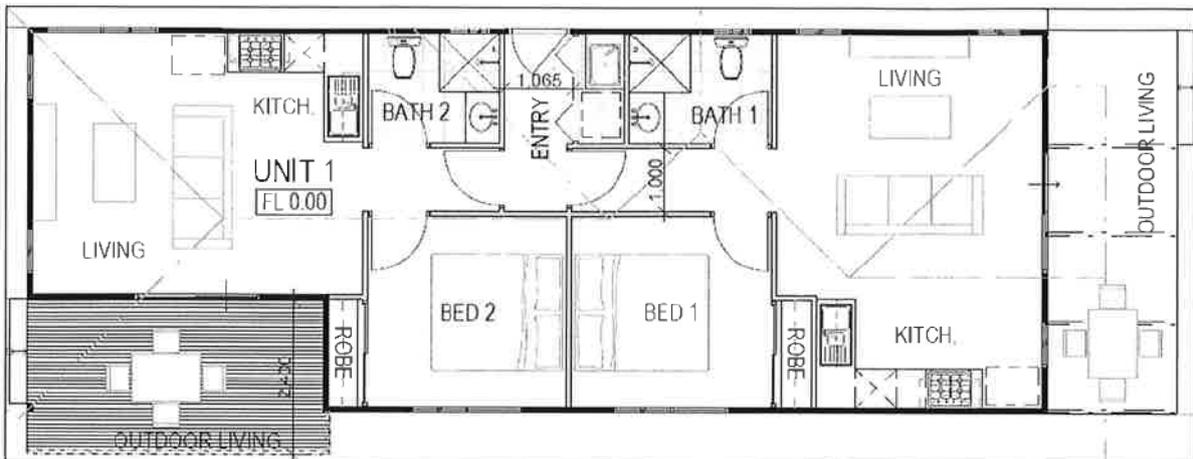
An example of a layout which has common laundry facilities but the form and function is two separate dwelling units. This would be classed as two multiple dwellings, two grouped dwellings or single house with ancillary dwelling.
